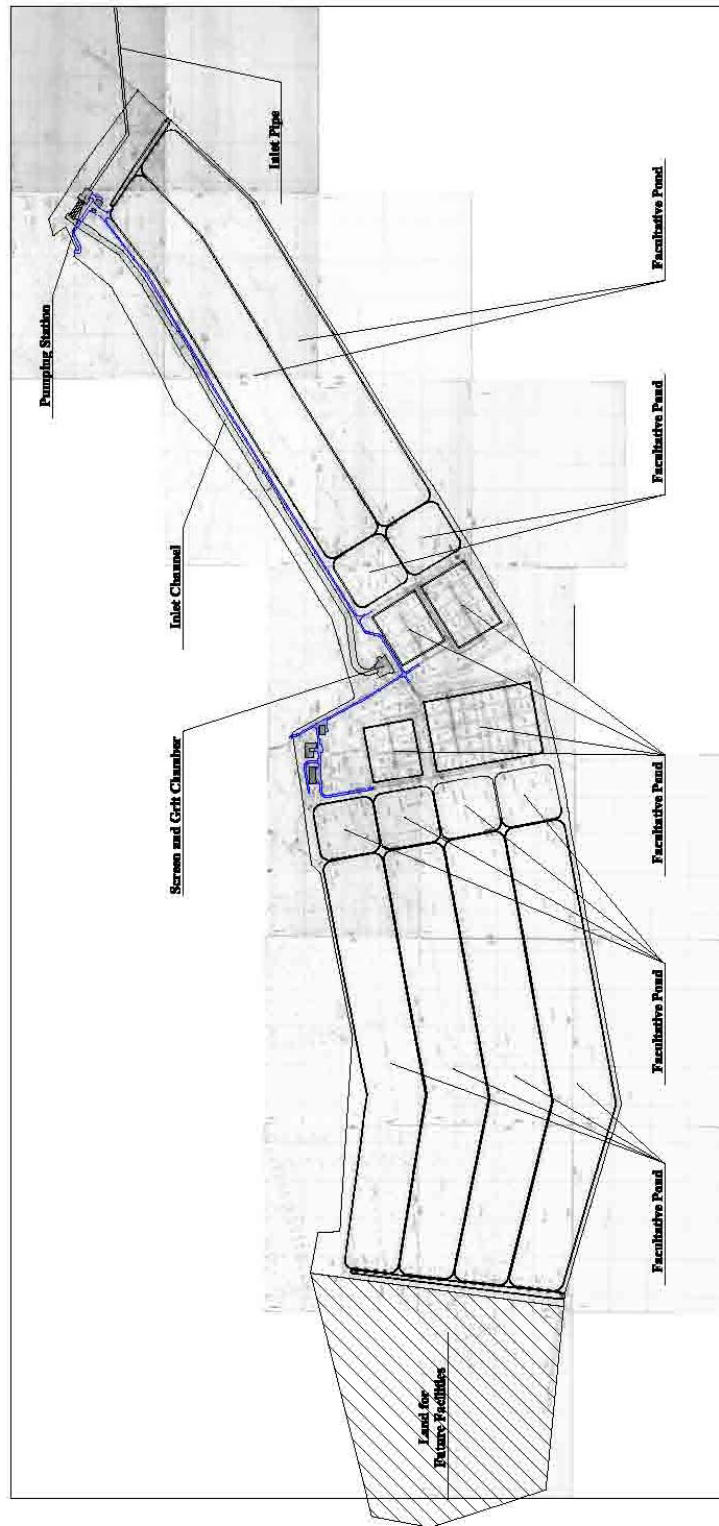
General Plan of Sewage Treatment Plant TP-3
